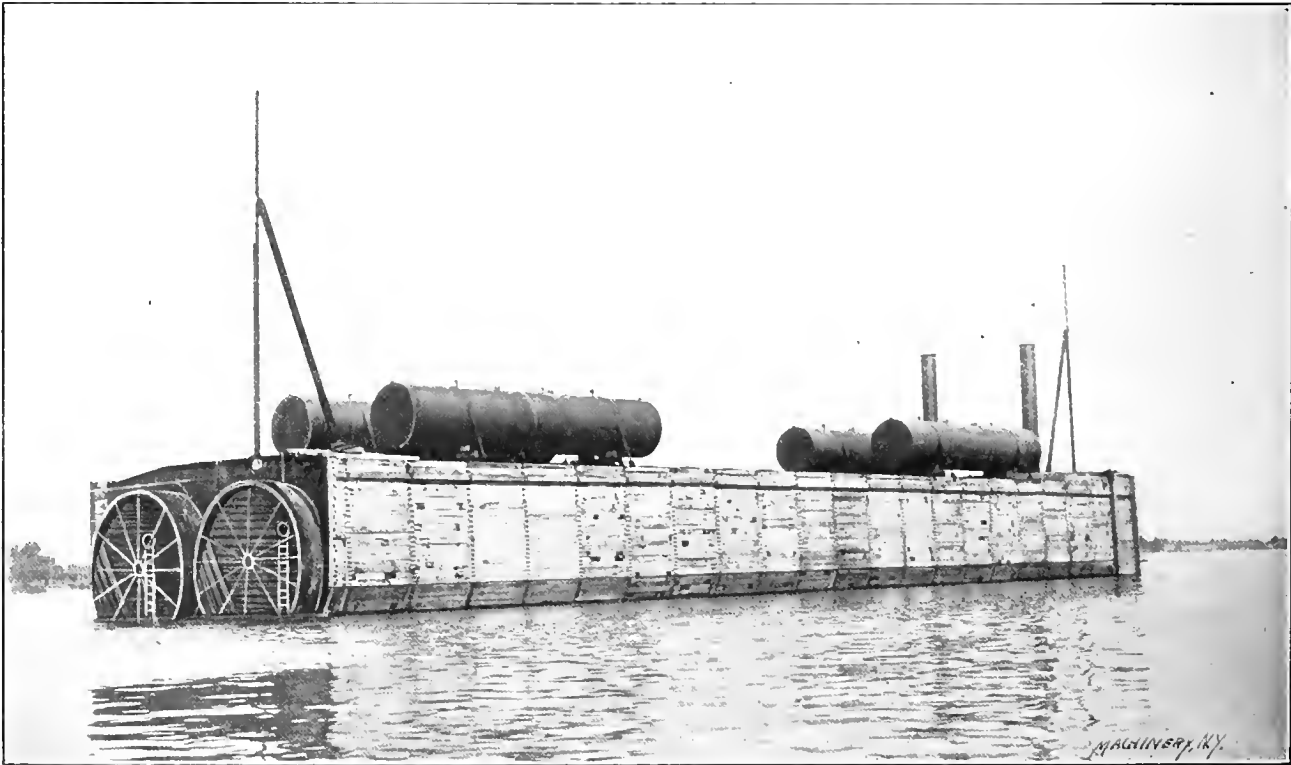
Complete Tunnel Section being Floated down the River to the Tunnel Location, where it was Sunk to the River Bed.
